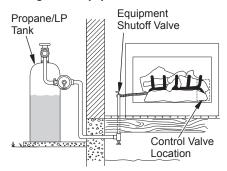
Checking Gas Joints (Propane/LP Gas Only)
